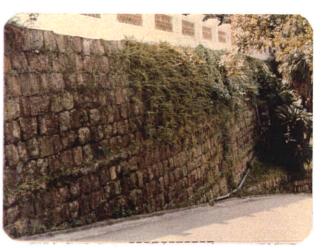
Dry Packed Squared Rubble Wall with Horizontal Beams (11SW-A/R163)
